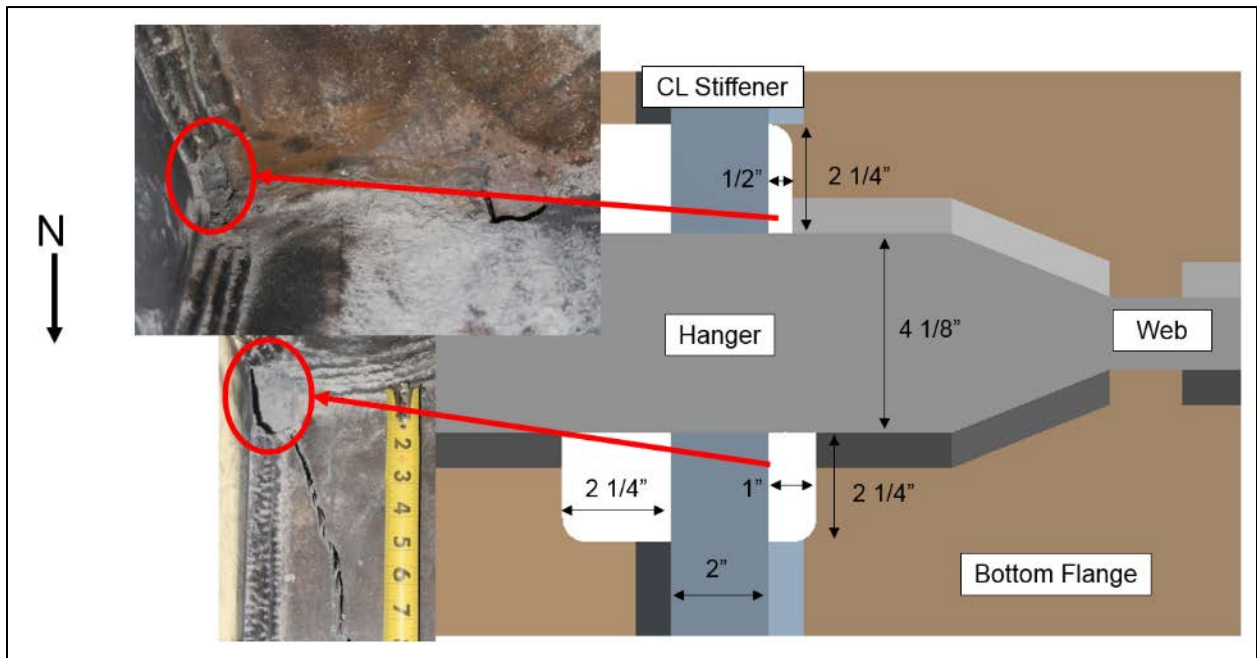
Weld access hole dimensions for the TPG3 girder on the Fremont Street D.4 line. Note that Appendix D contains all relevant TPG3 girder dimensions.
